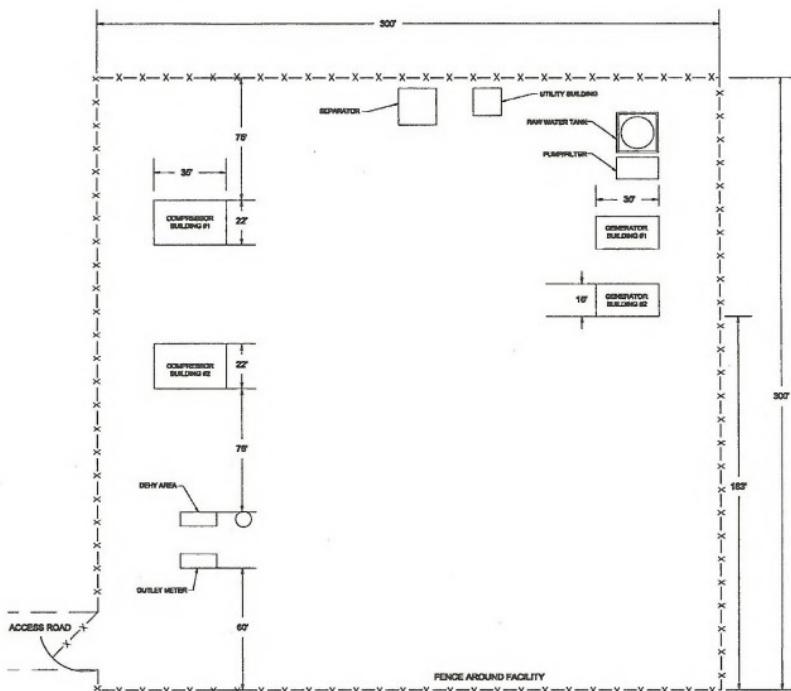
Typical Compression Facility – Atlantic Rim Natural Gas Project.
